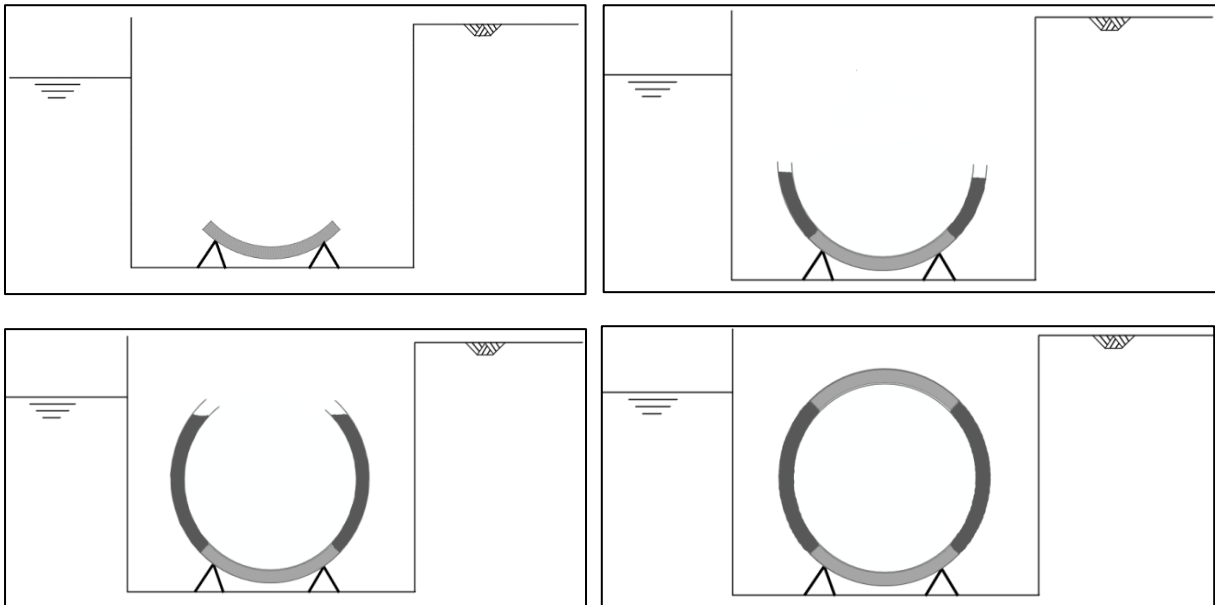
Printing outer and inner shell and casting of concrete (2D view). The bottom and top element can be made with prefab elements (light grey).
